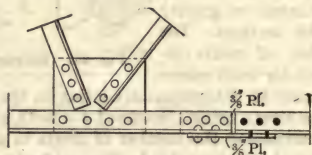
Detail of Joint E and Splice in EH, Fink Truss, Fig. 7
